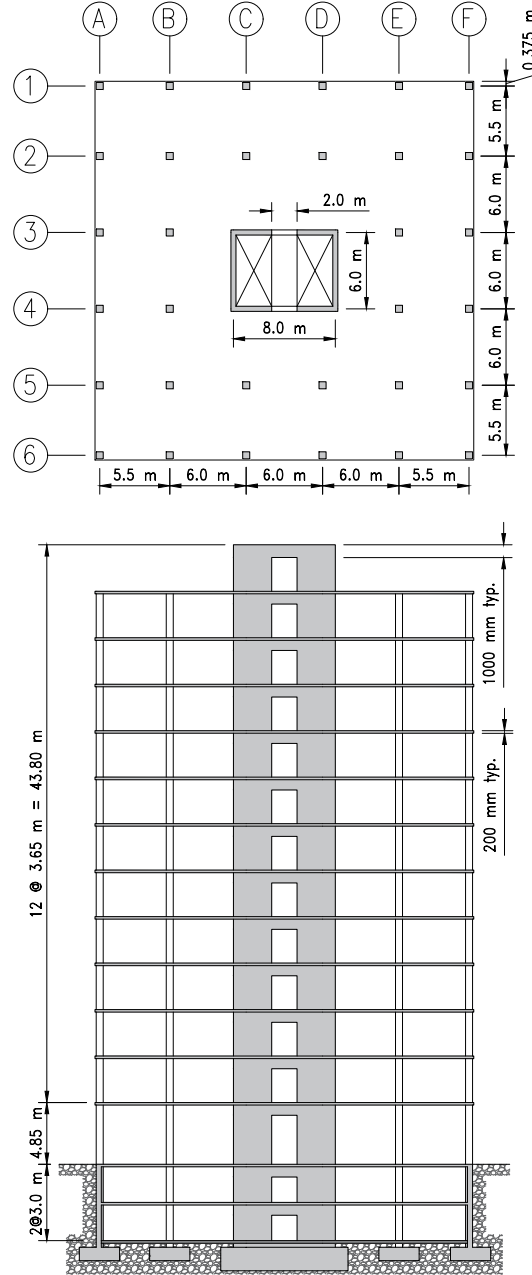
Plan and elevation of the studied building adapted from [\[17\]](#).
